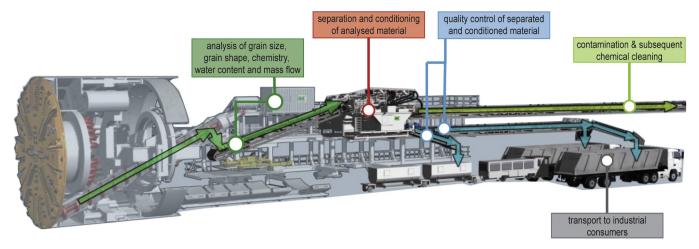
Schematic on-line analysis of excavated rock and soil material shown on a tunnel boring machine (TBM) for mechanical excavation.
